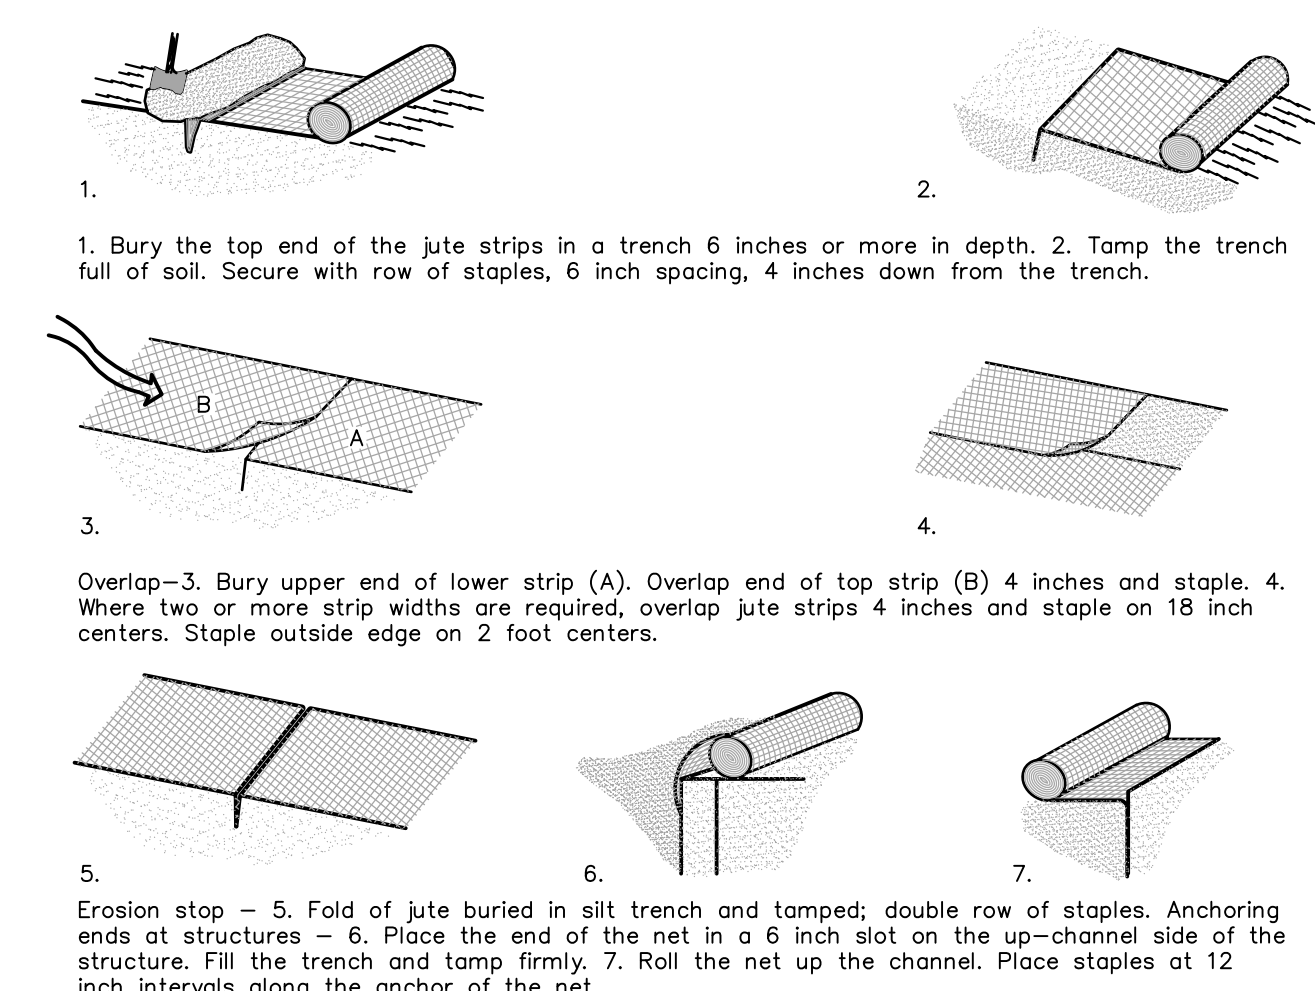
DETAIL FOR INSTALLATION OF JUTE NETTING
